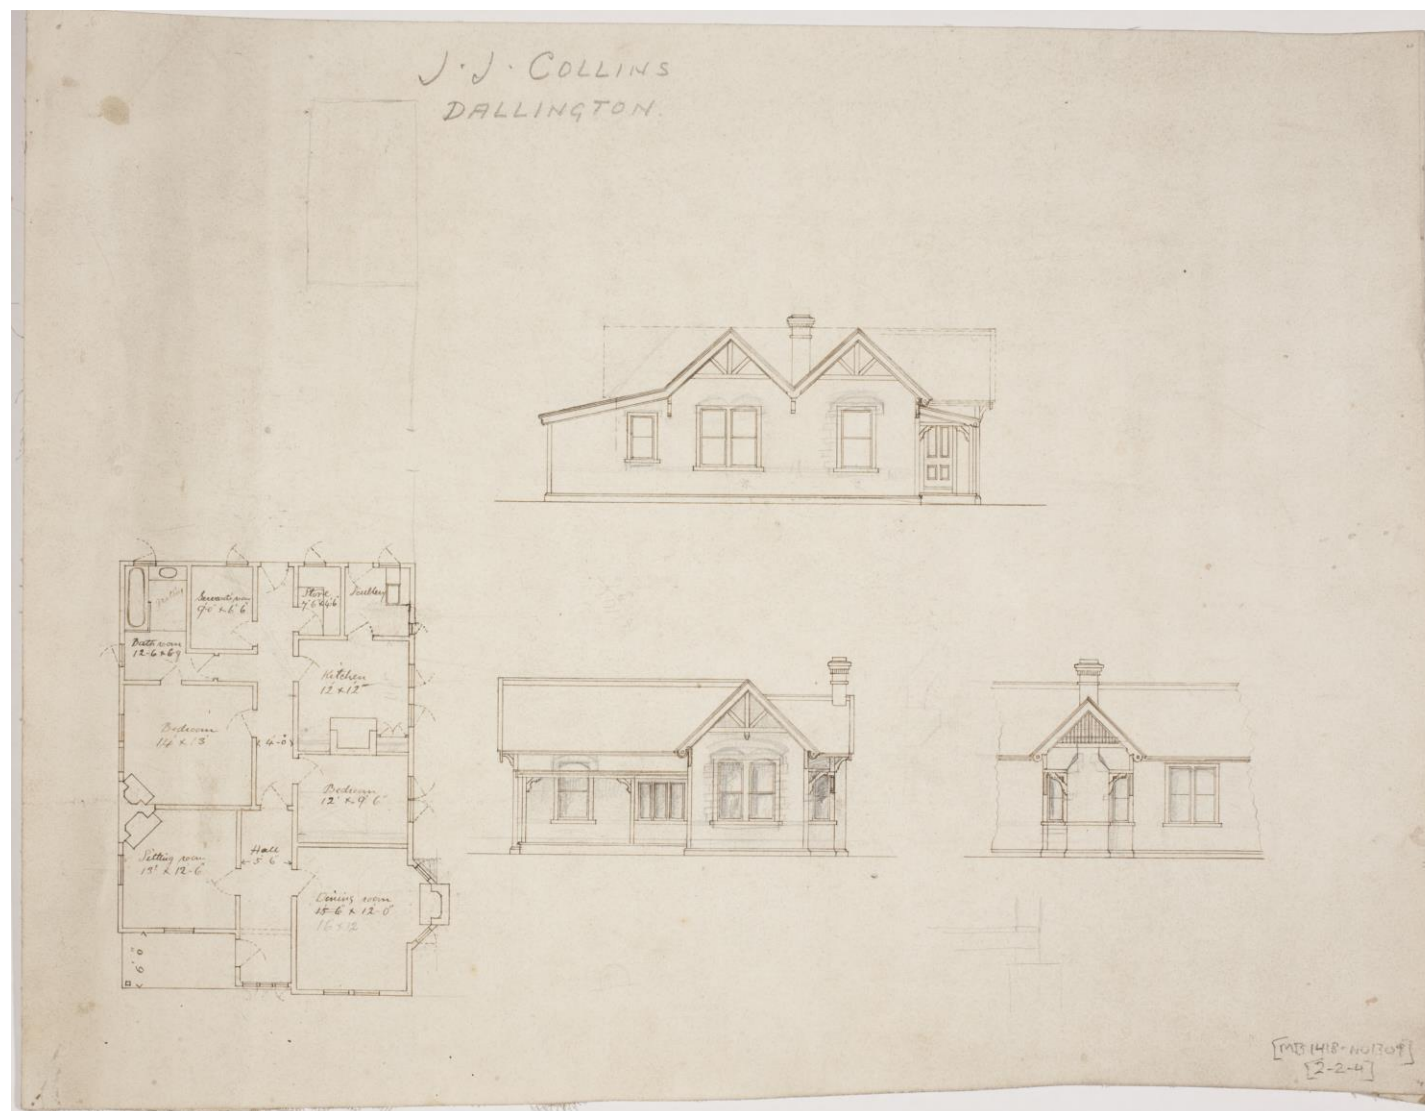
Collins and Harman, J. J. Collins, Dallington, plan and elevations (undated).
